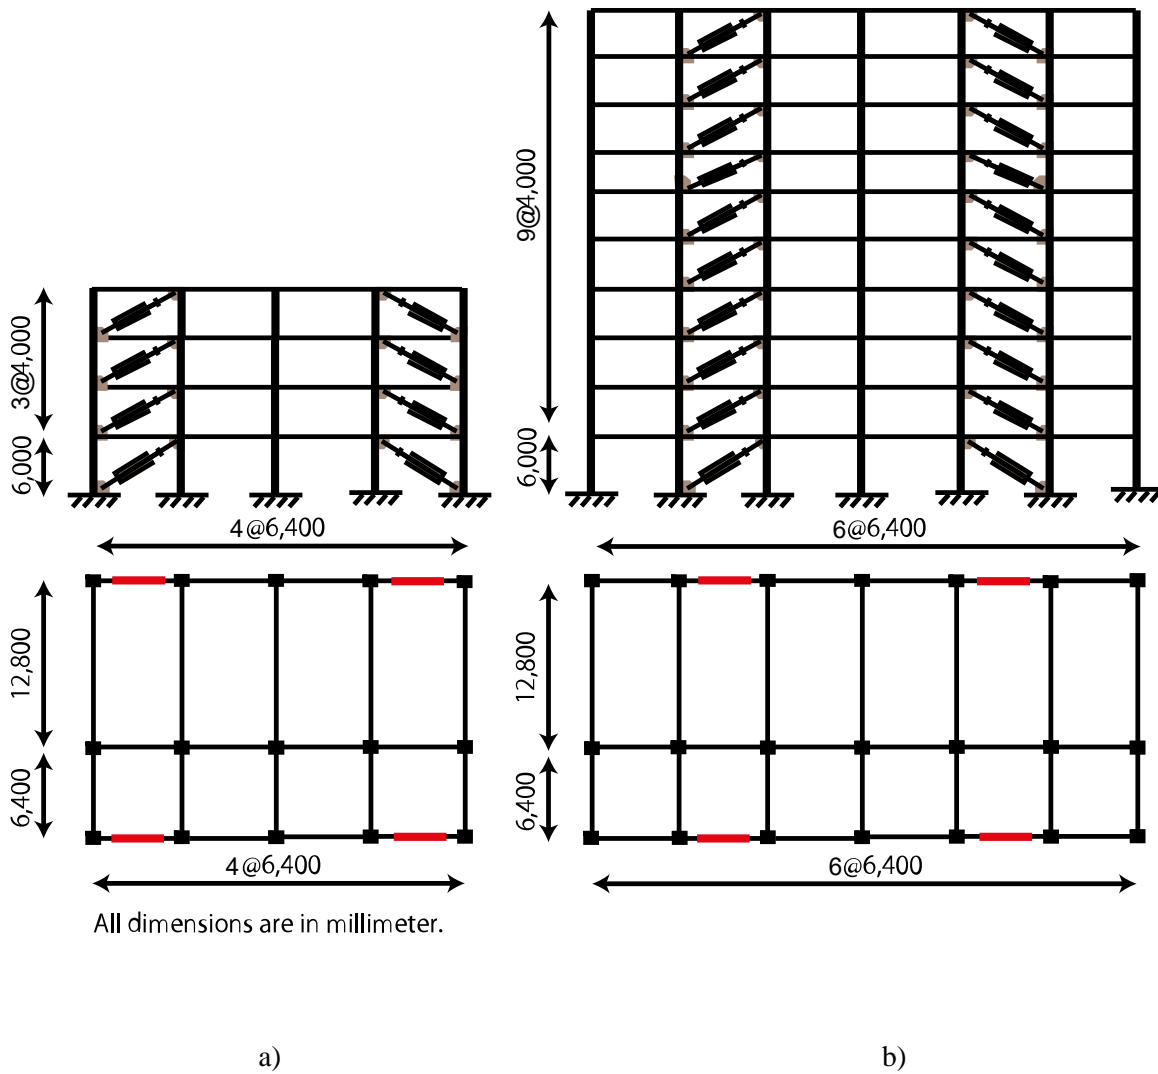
Target buildings plan, elevation, and oil damper configuration: a) 4-story building; b) 10-story building.
